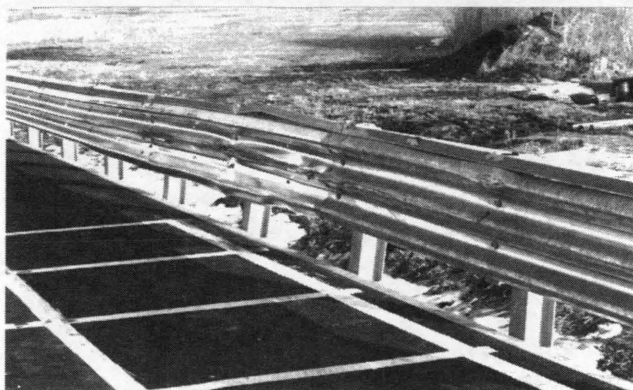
Impact location, vehicle damage, and bridge rail damage, Test FSTC-1.
